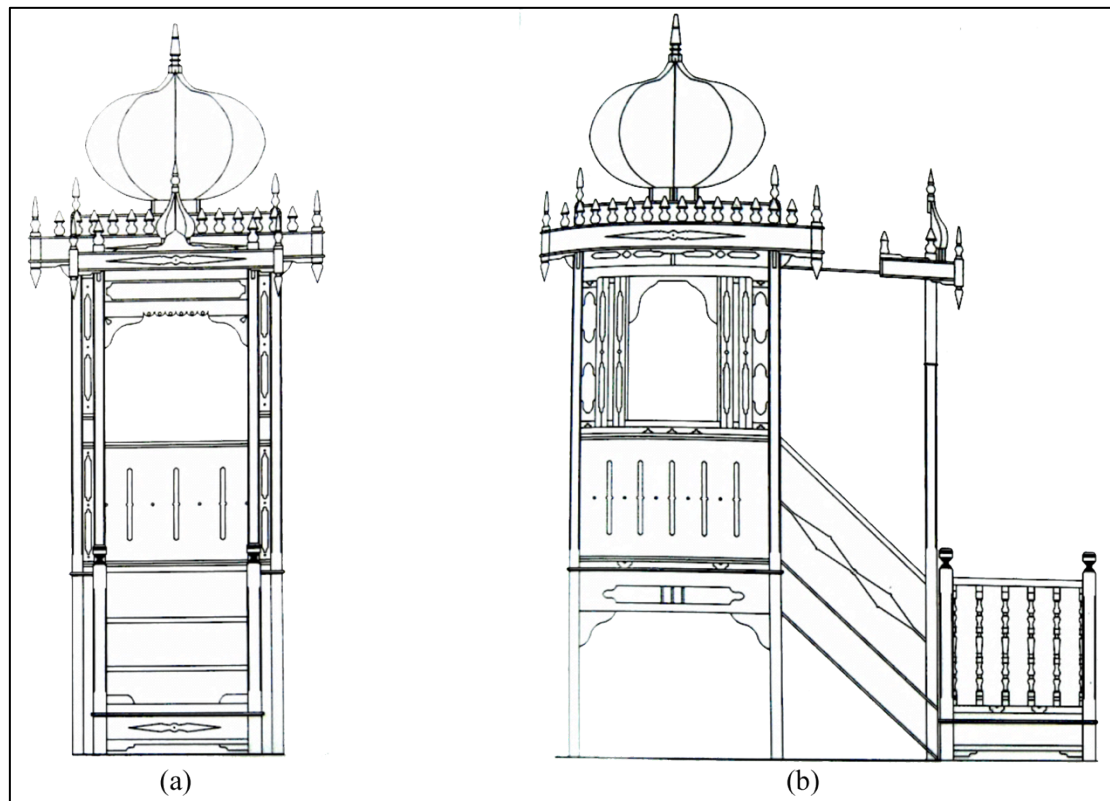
Masjid Teluk Manok *mimbar* drawings, (a) front elevation and (b) side elevation
